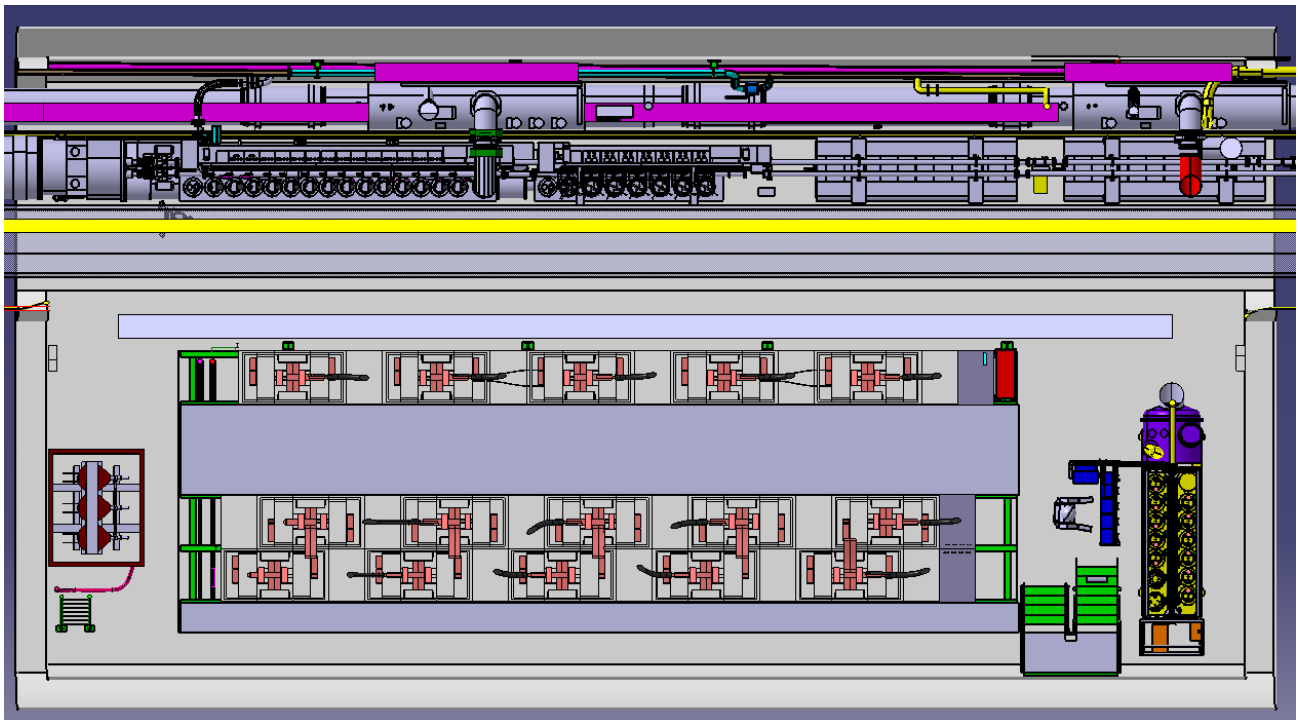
Present CAD drawing layout of the installed equipment in the ground floor of RR13 + LHC half cell, ST number ST0509462
